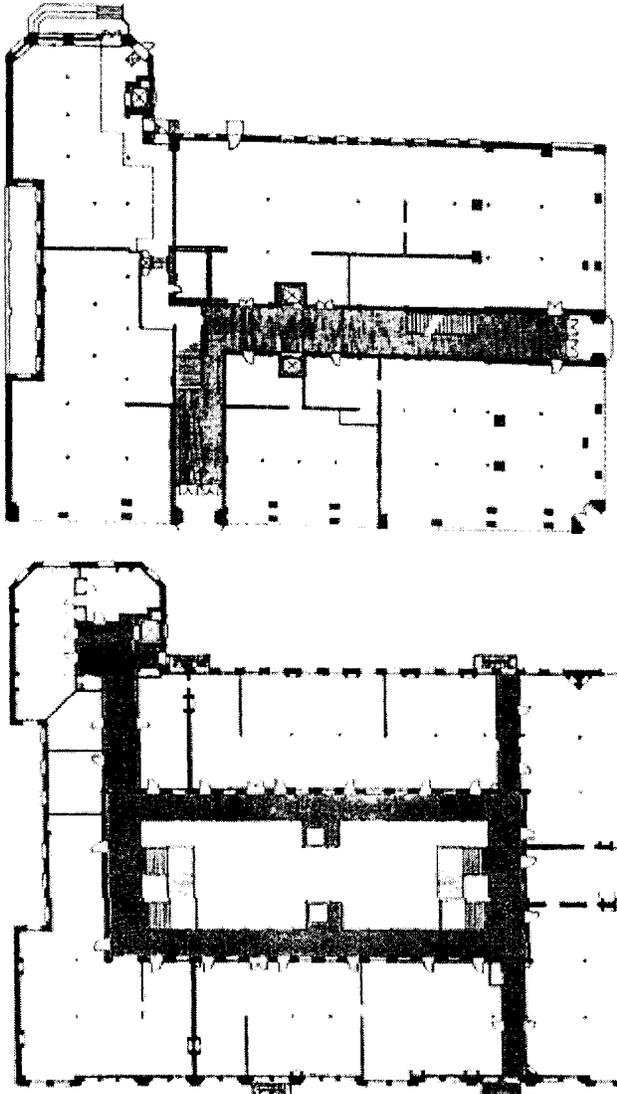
Bradbury Building first floor plan and typical floor plan (north is up in the drawings).
